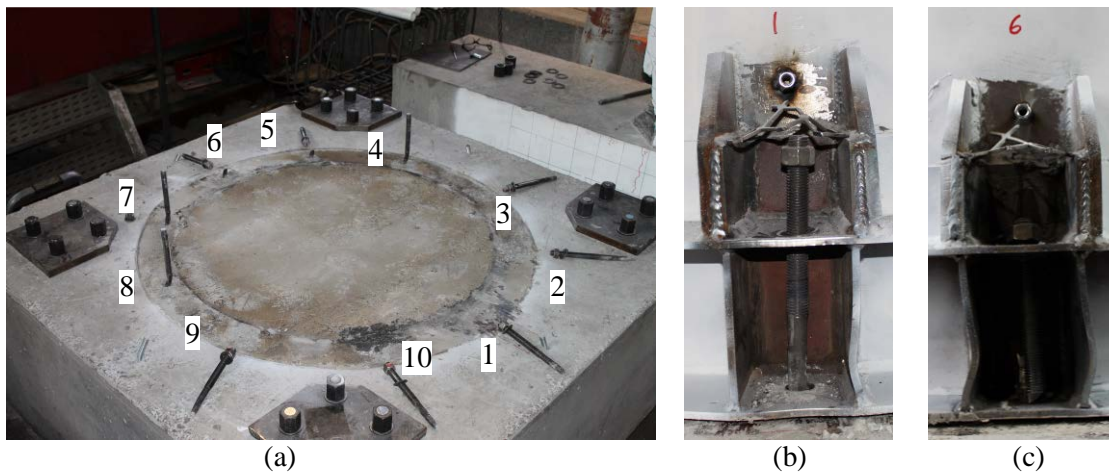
Anchored Cask Damage: (a) Bolt Failures; (b) Chair 1 damage; (c) Chair 6 damage
